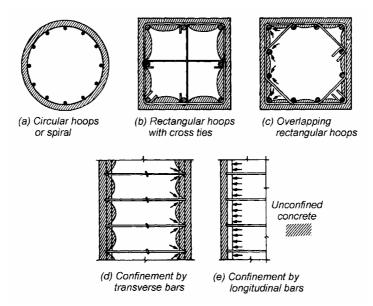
Arrangements of reinforcement that confine the concrete and prevent premature buckling of longitudinal reinforcement of columns
